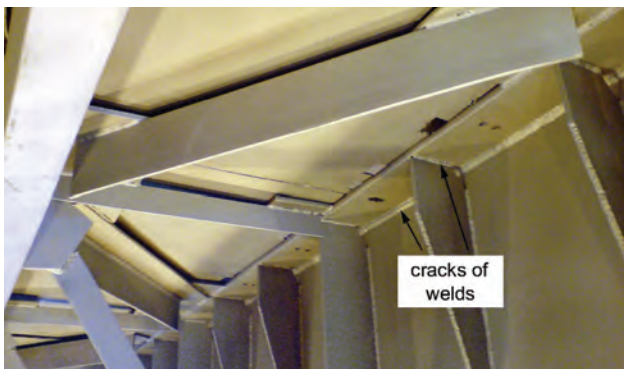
Damage of one of the crane beams: weld cracks at the interface between the web and ribs and the upper flange
